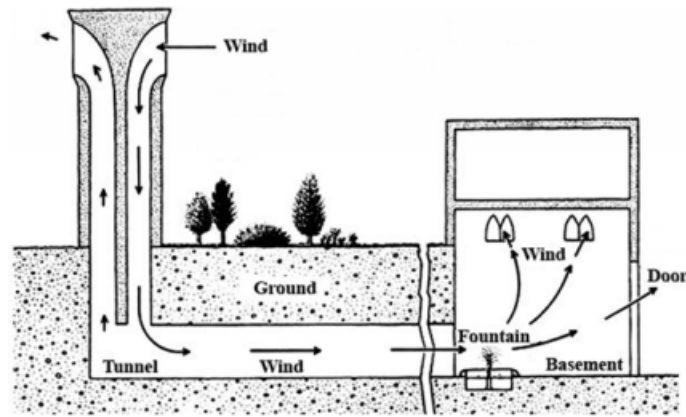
Section of an Iranian Baudgeer house (Bahadori, 1978)
